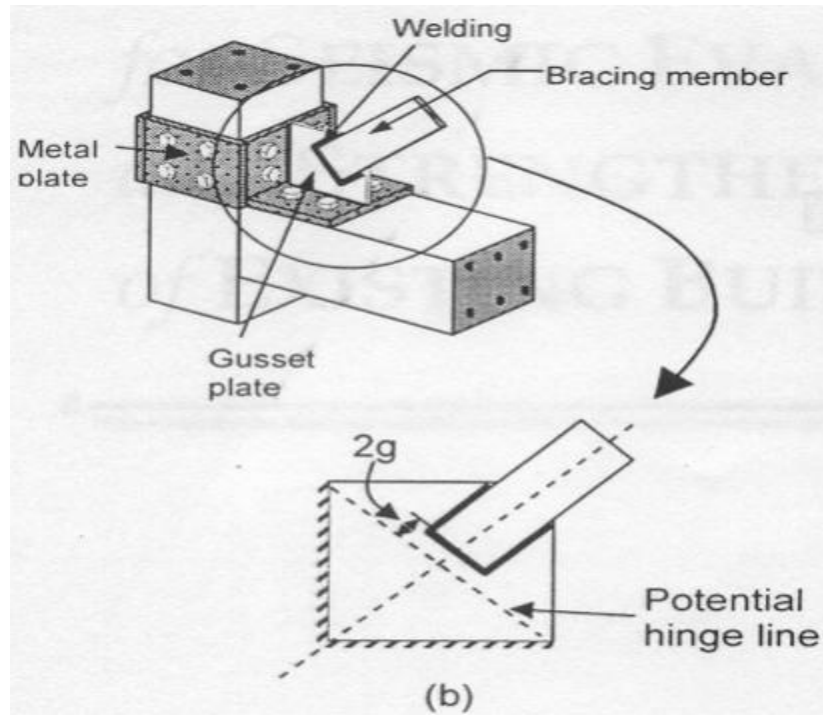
(a) Brace connection details (b) Gusset base connection detail
